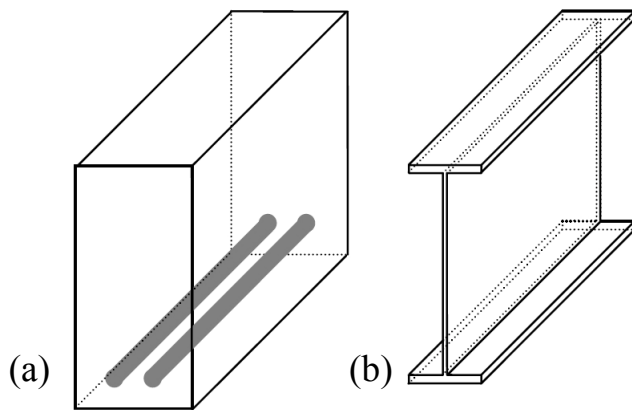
Schematic of structure (a) reinforced concrete beam and (b) steel I beam
